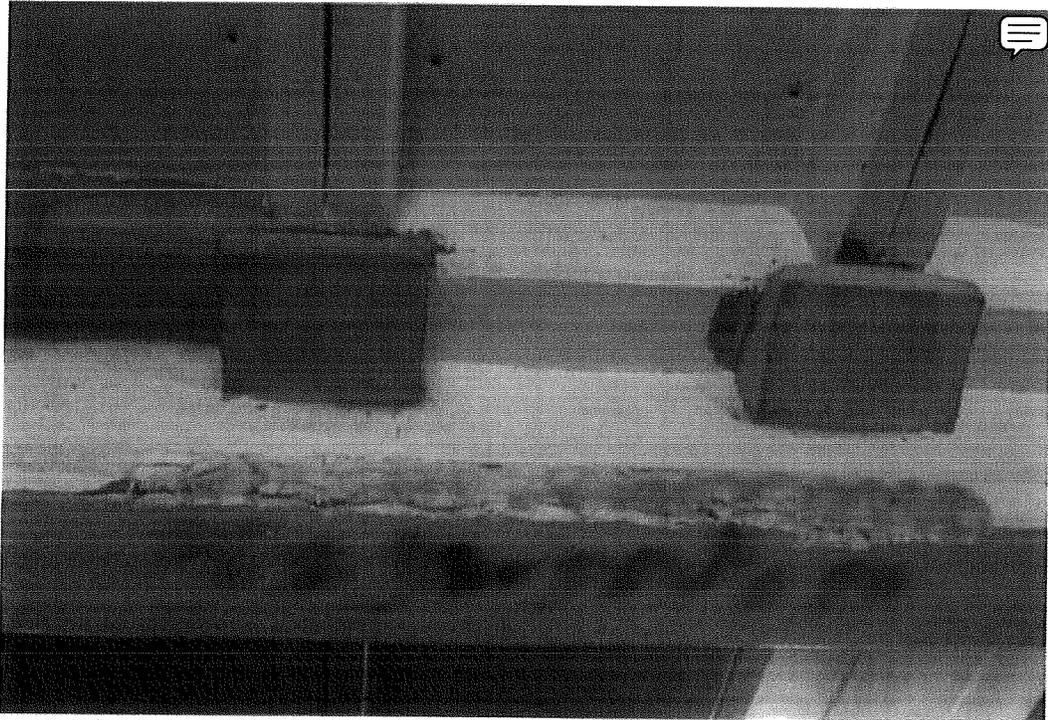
Cracked and hollow sounding concrete encasement. Underside of Parking Level 6 Along Column Line U1, between Column Lines 27 & 29. (Approx. 10 SF)
